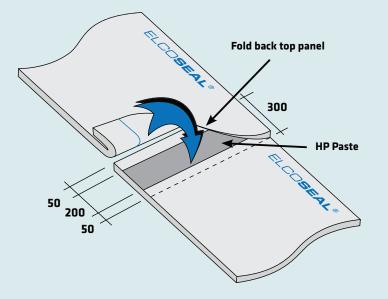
Transverse (end) overlap installation with applied HP Paste of minimum 200 mm width
